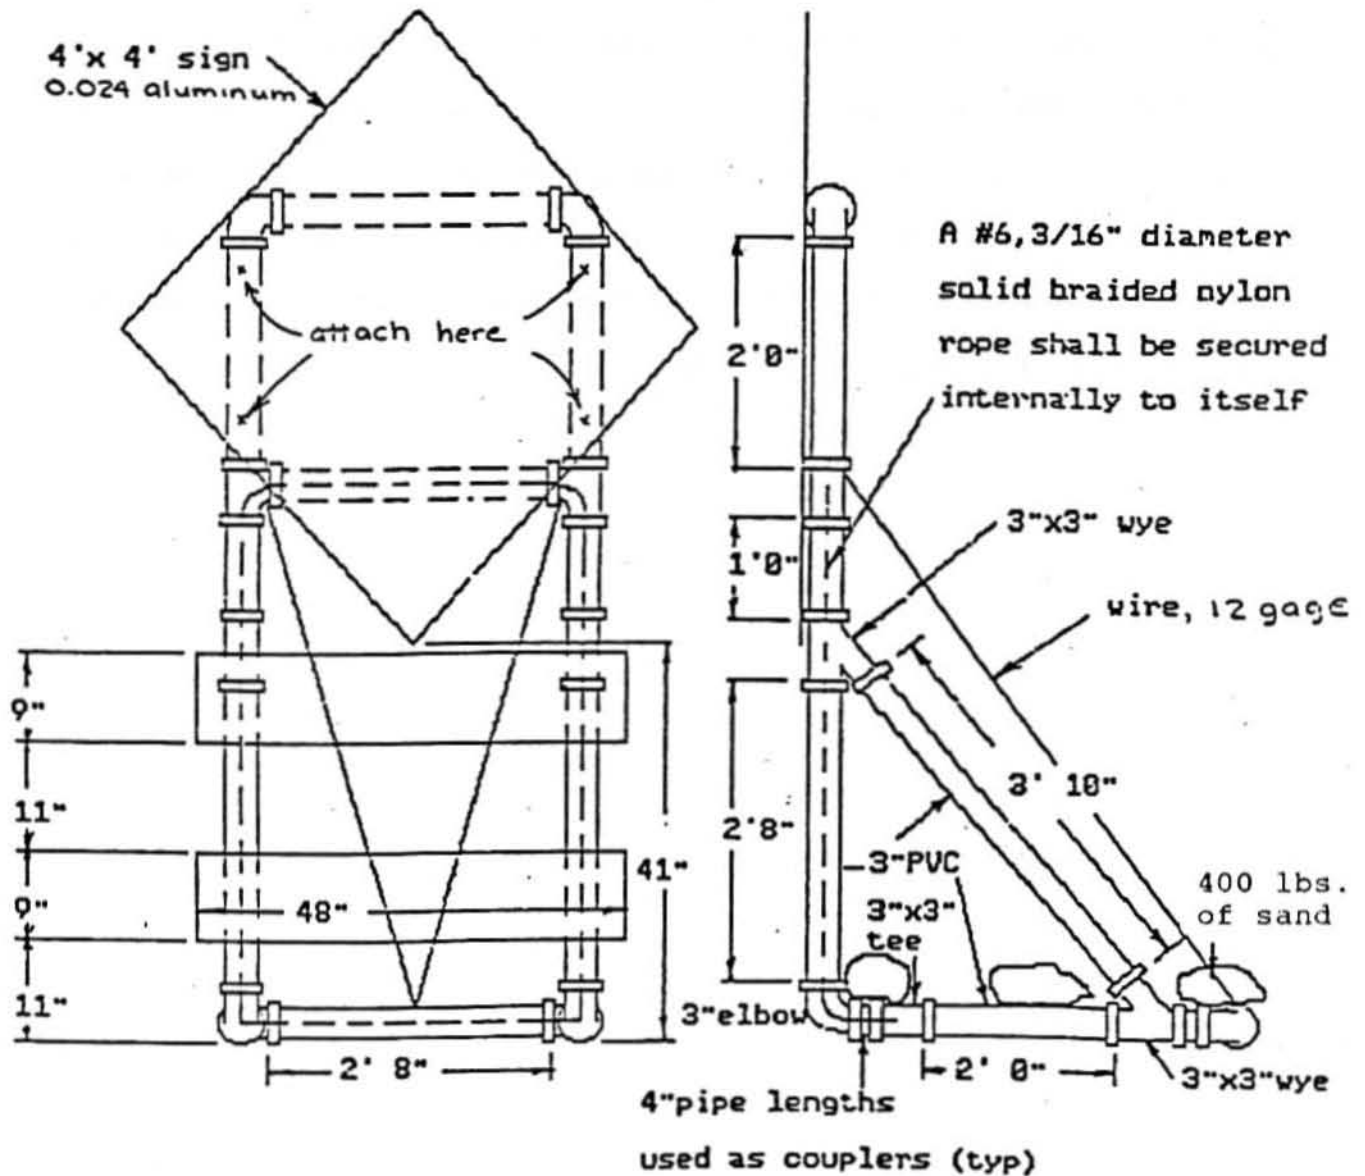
Breakaway Barricade For Test No. 7 and Test No. 8
